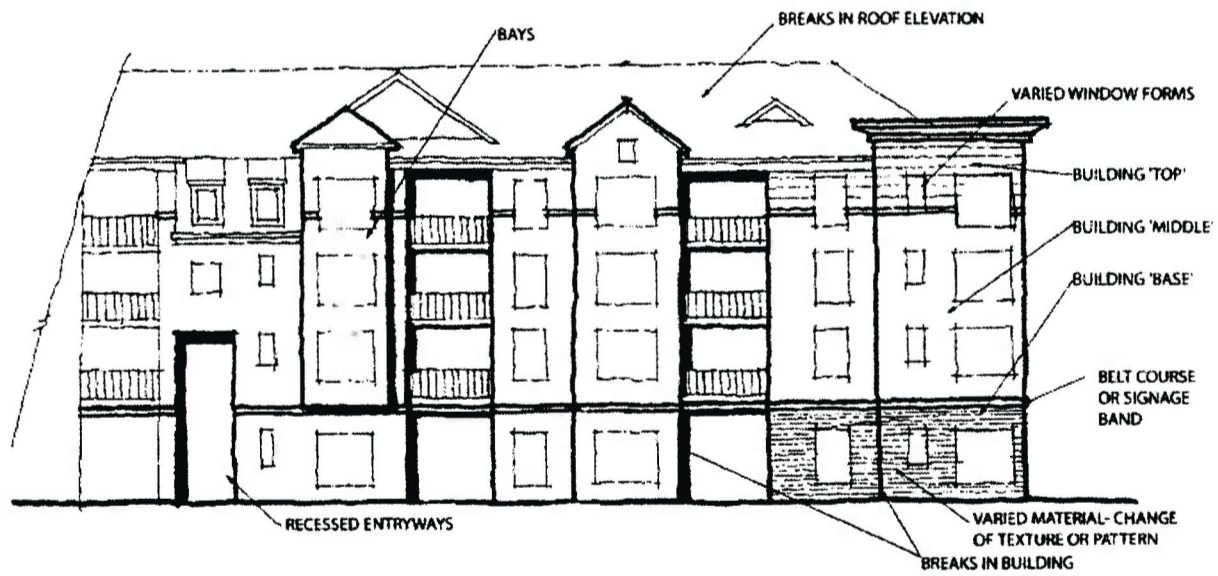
Multi-Family Design Features – Vertical and Horizontal Building Articulation
